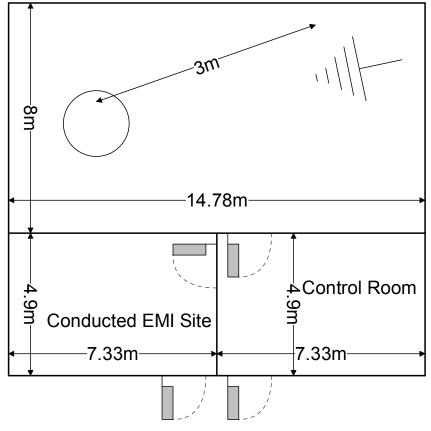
Semi-Anechoic Chamber Test Site
